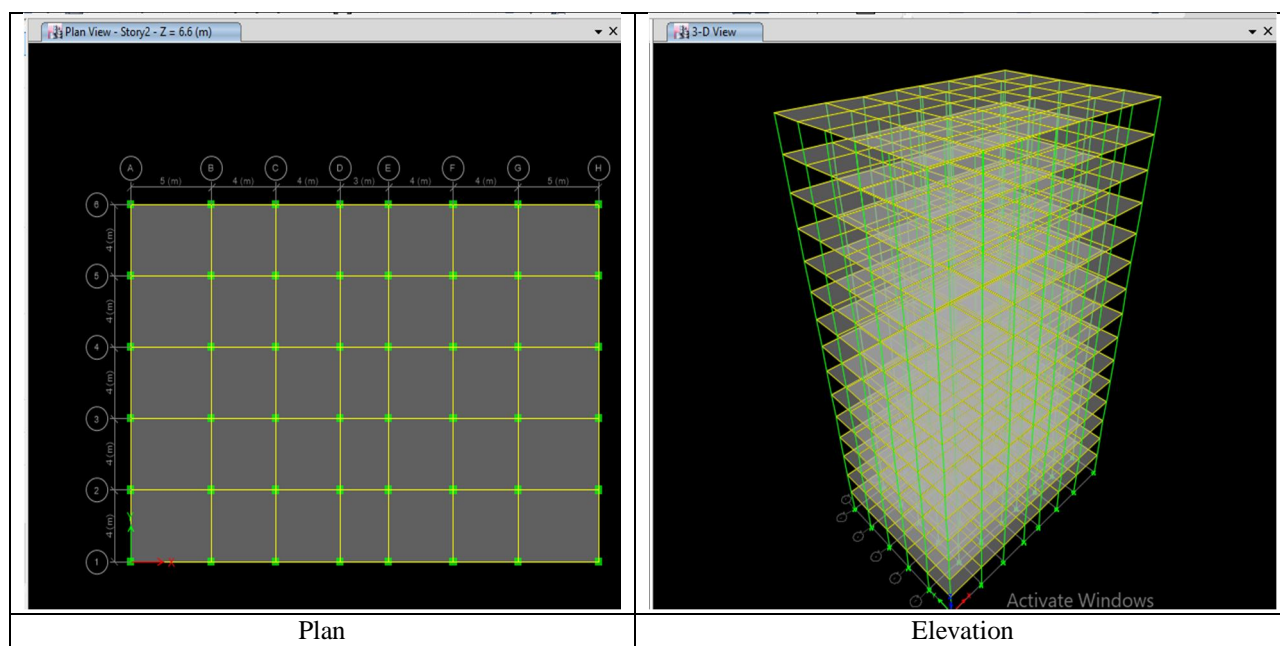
Geometric of G+15 storied reinforced concrete frame model in CSI ETABS
